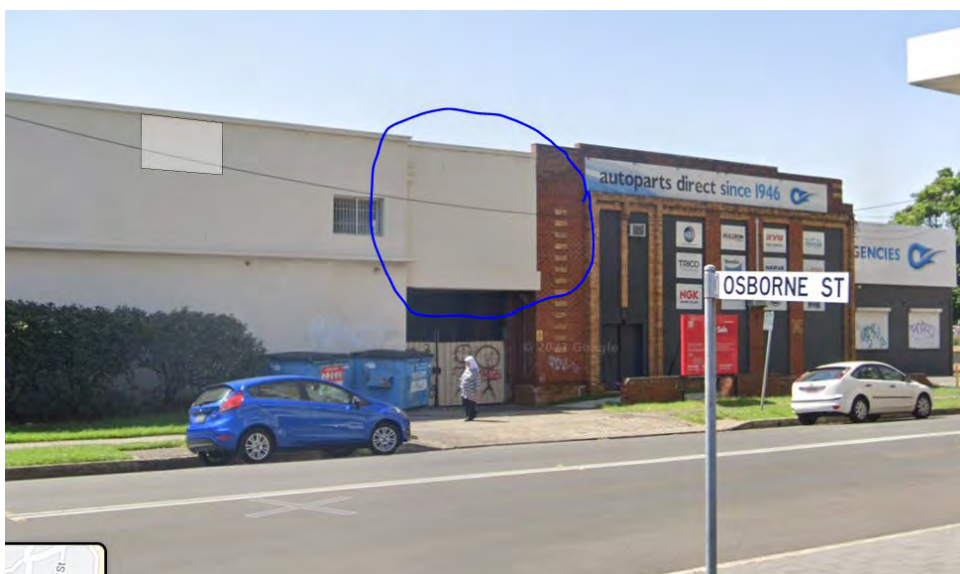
Site photo of connecting structure overhanging the adjacent laneway
